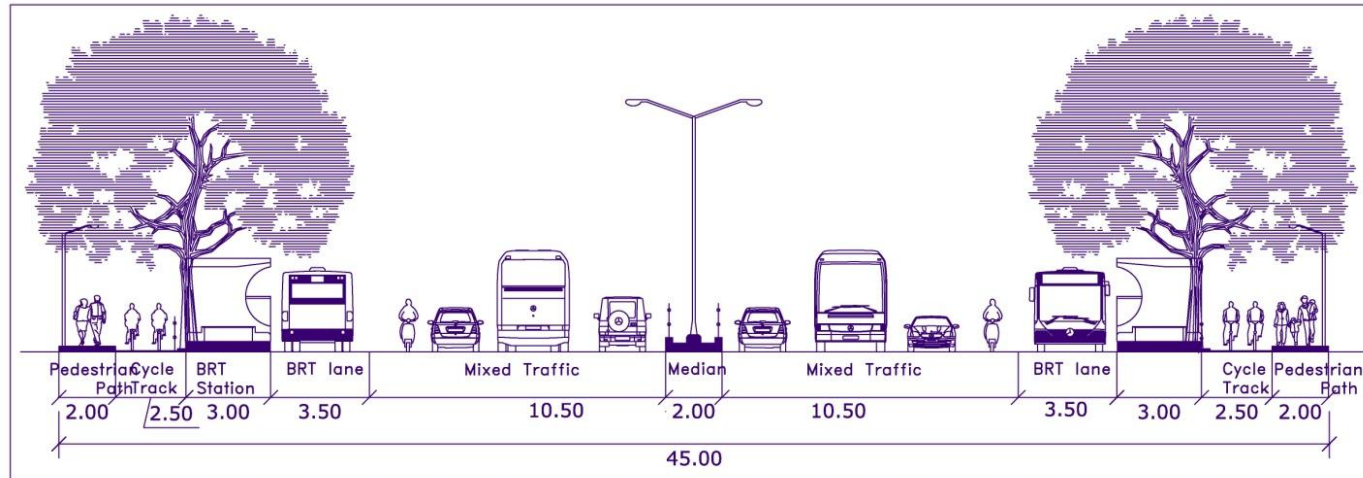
3-7: Schematic cross section showing Kerb Side BRT Lane
